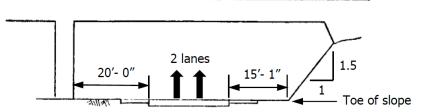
Bridge elevation view of horizontal clearances for a 2-lane highway with 1-way traffic below the bridge.
